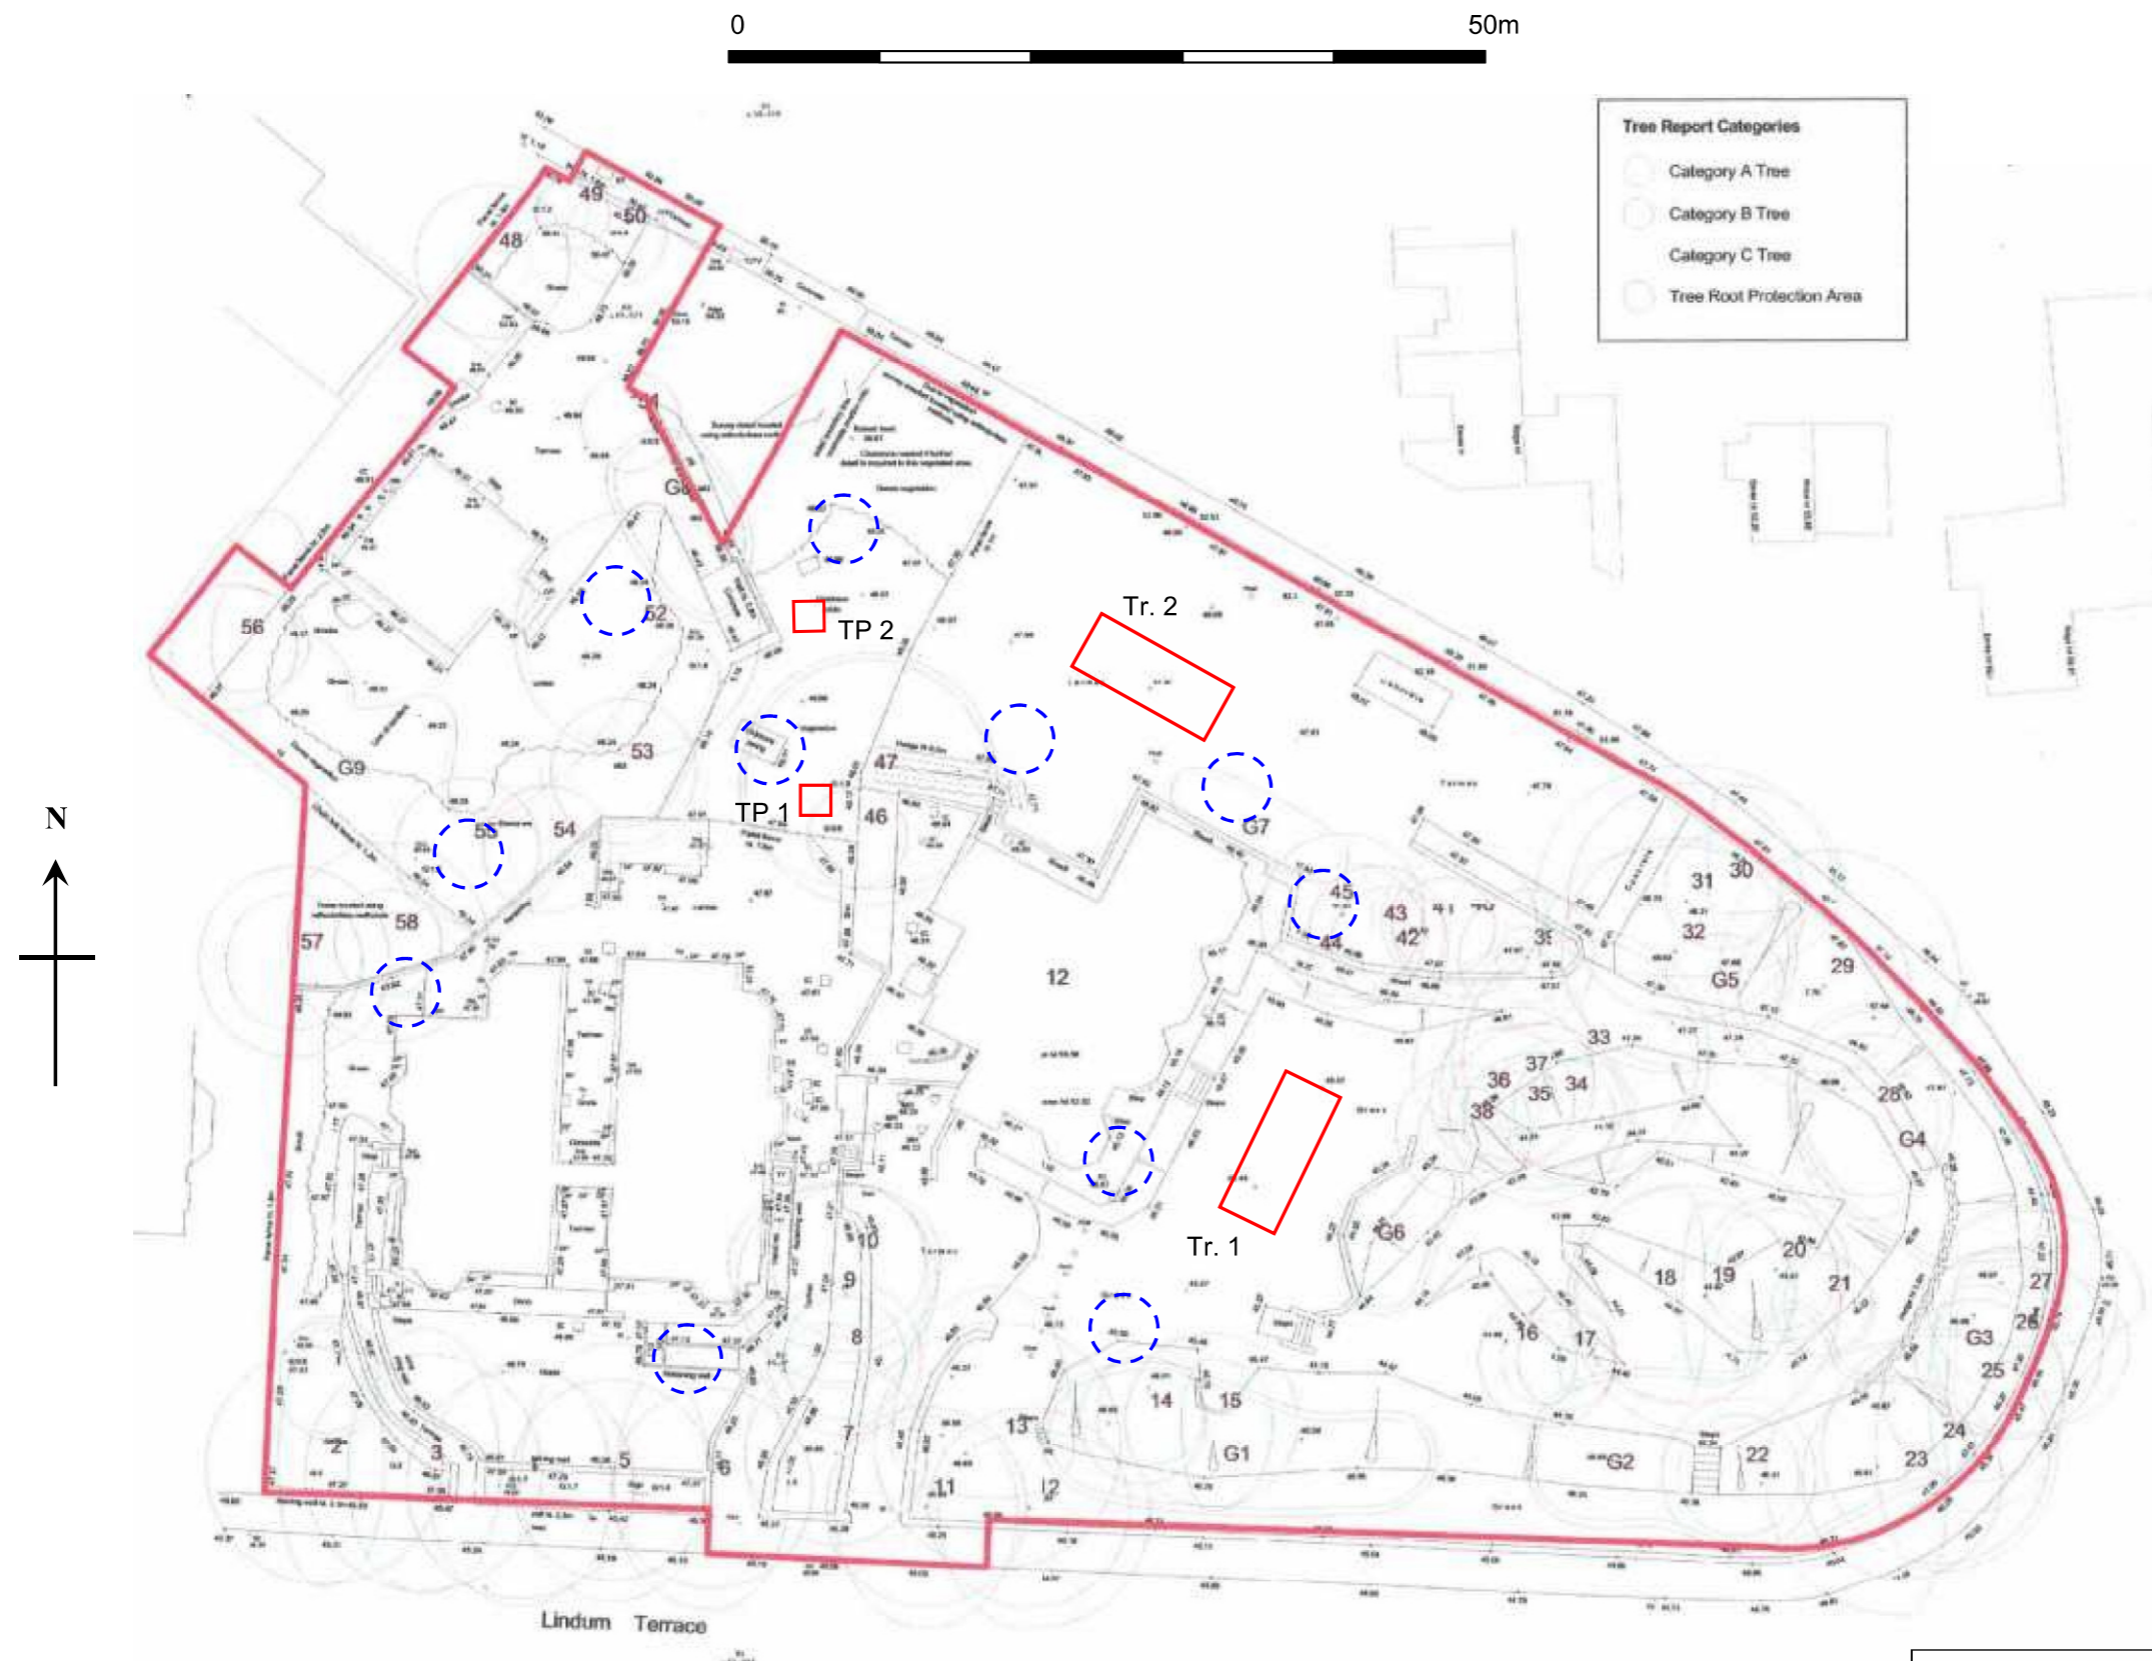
As-existing plan of the development site at scale 1:500, showing the existing buildings, site topography and ground cover. The proposed trench and test pit positions are marked in red; broken blue lines indicate the approximate positions of previous geotechnical interventions (after HSP, 2015).
